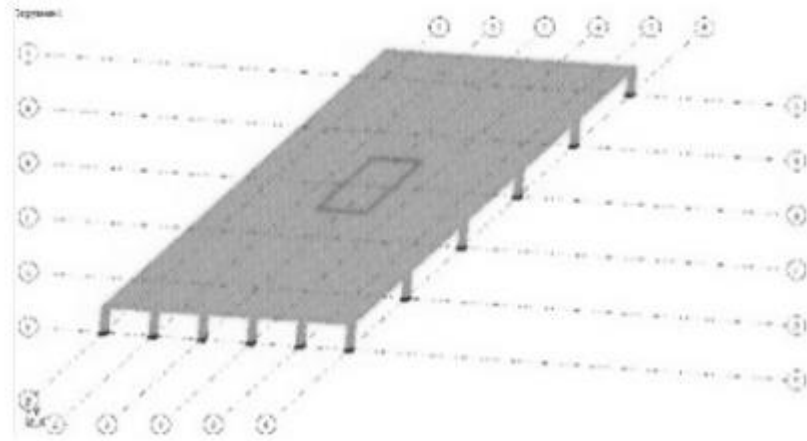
Scheme of a monolithic floor with rope-mounted reinforcement of the central cell
